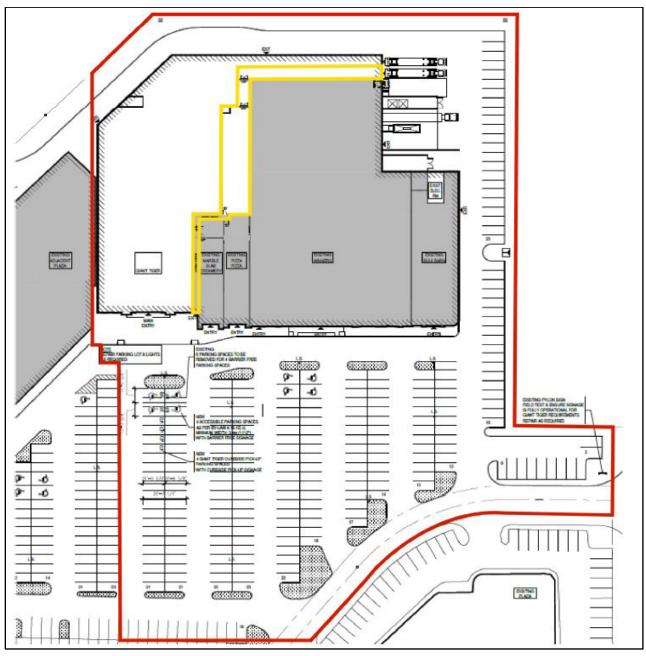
Site Plan of 50 North Centre Road depicting the location of the Commercial Recreation Establishment (in Yellow)
